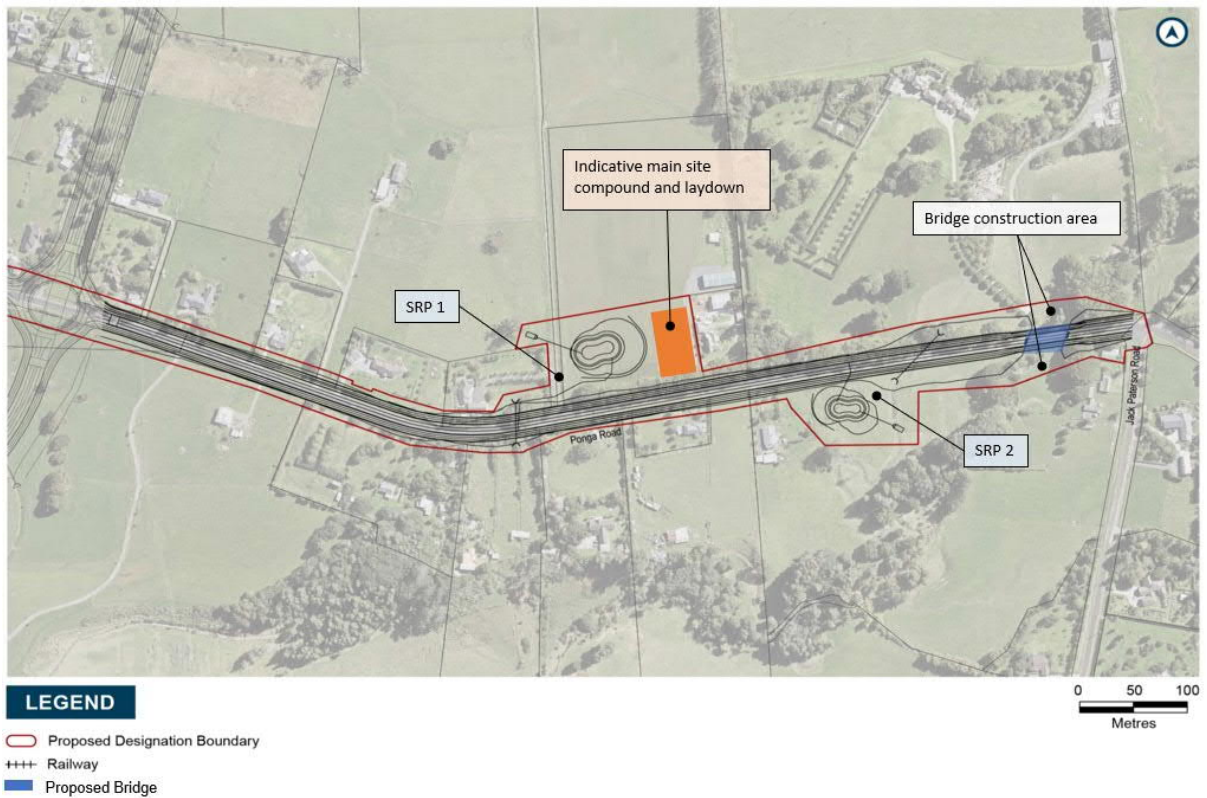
Indicative Construction Compounds, Laydown Areas and SRP locations for Ponga Road Upgrade
